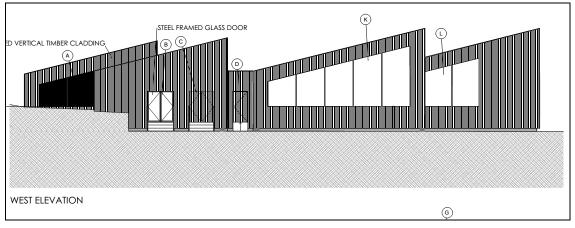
Gym West Elevation Approved by 16/04368/FUL
